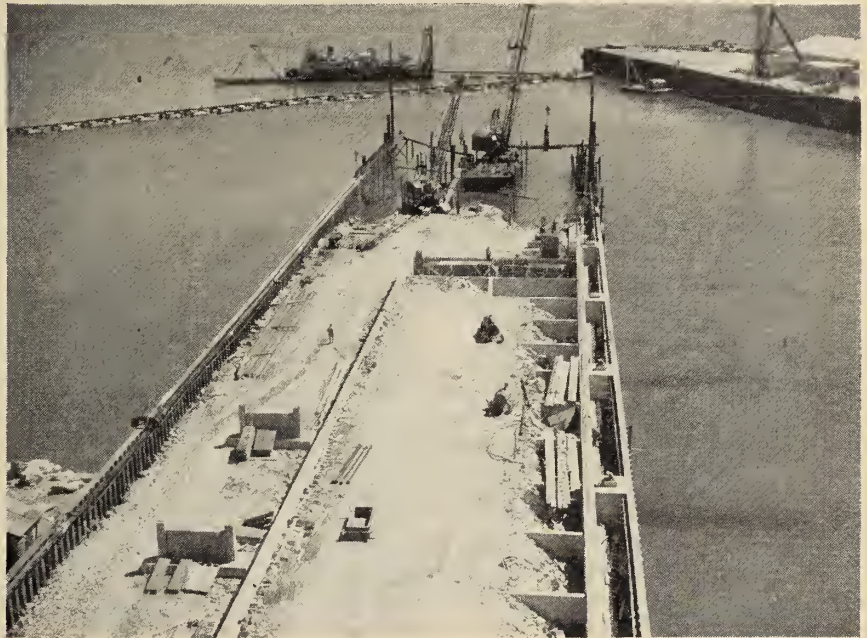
Jetty construction showing unloading equipment foundations. Dredge working in background.
